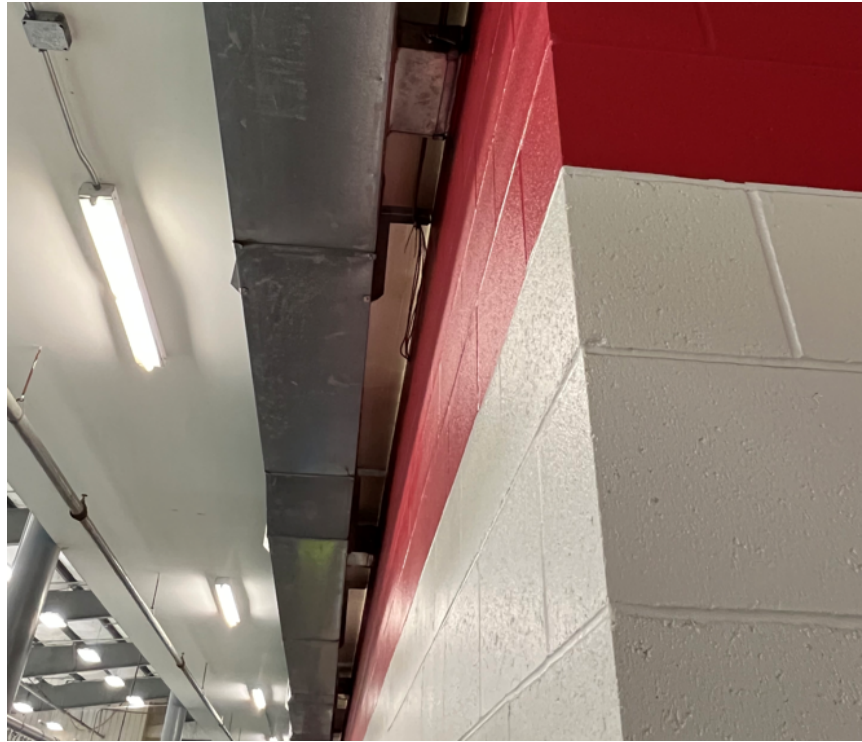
Furnace Ducting to Restrooms & Kitchen
